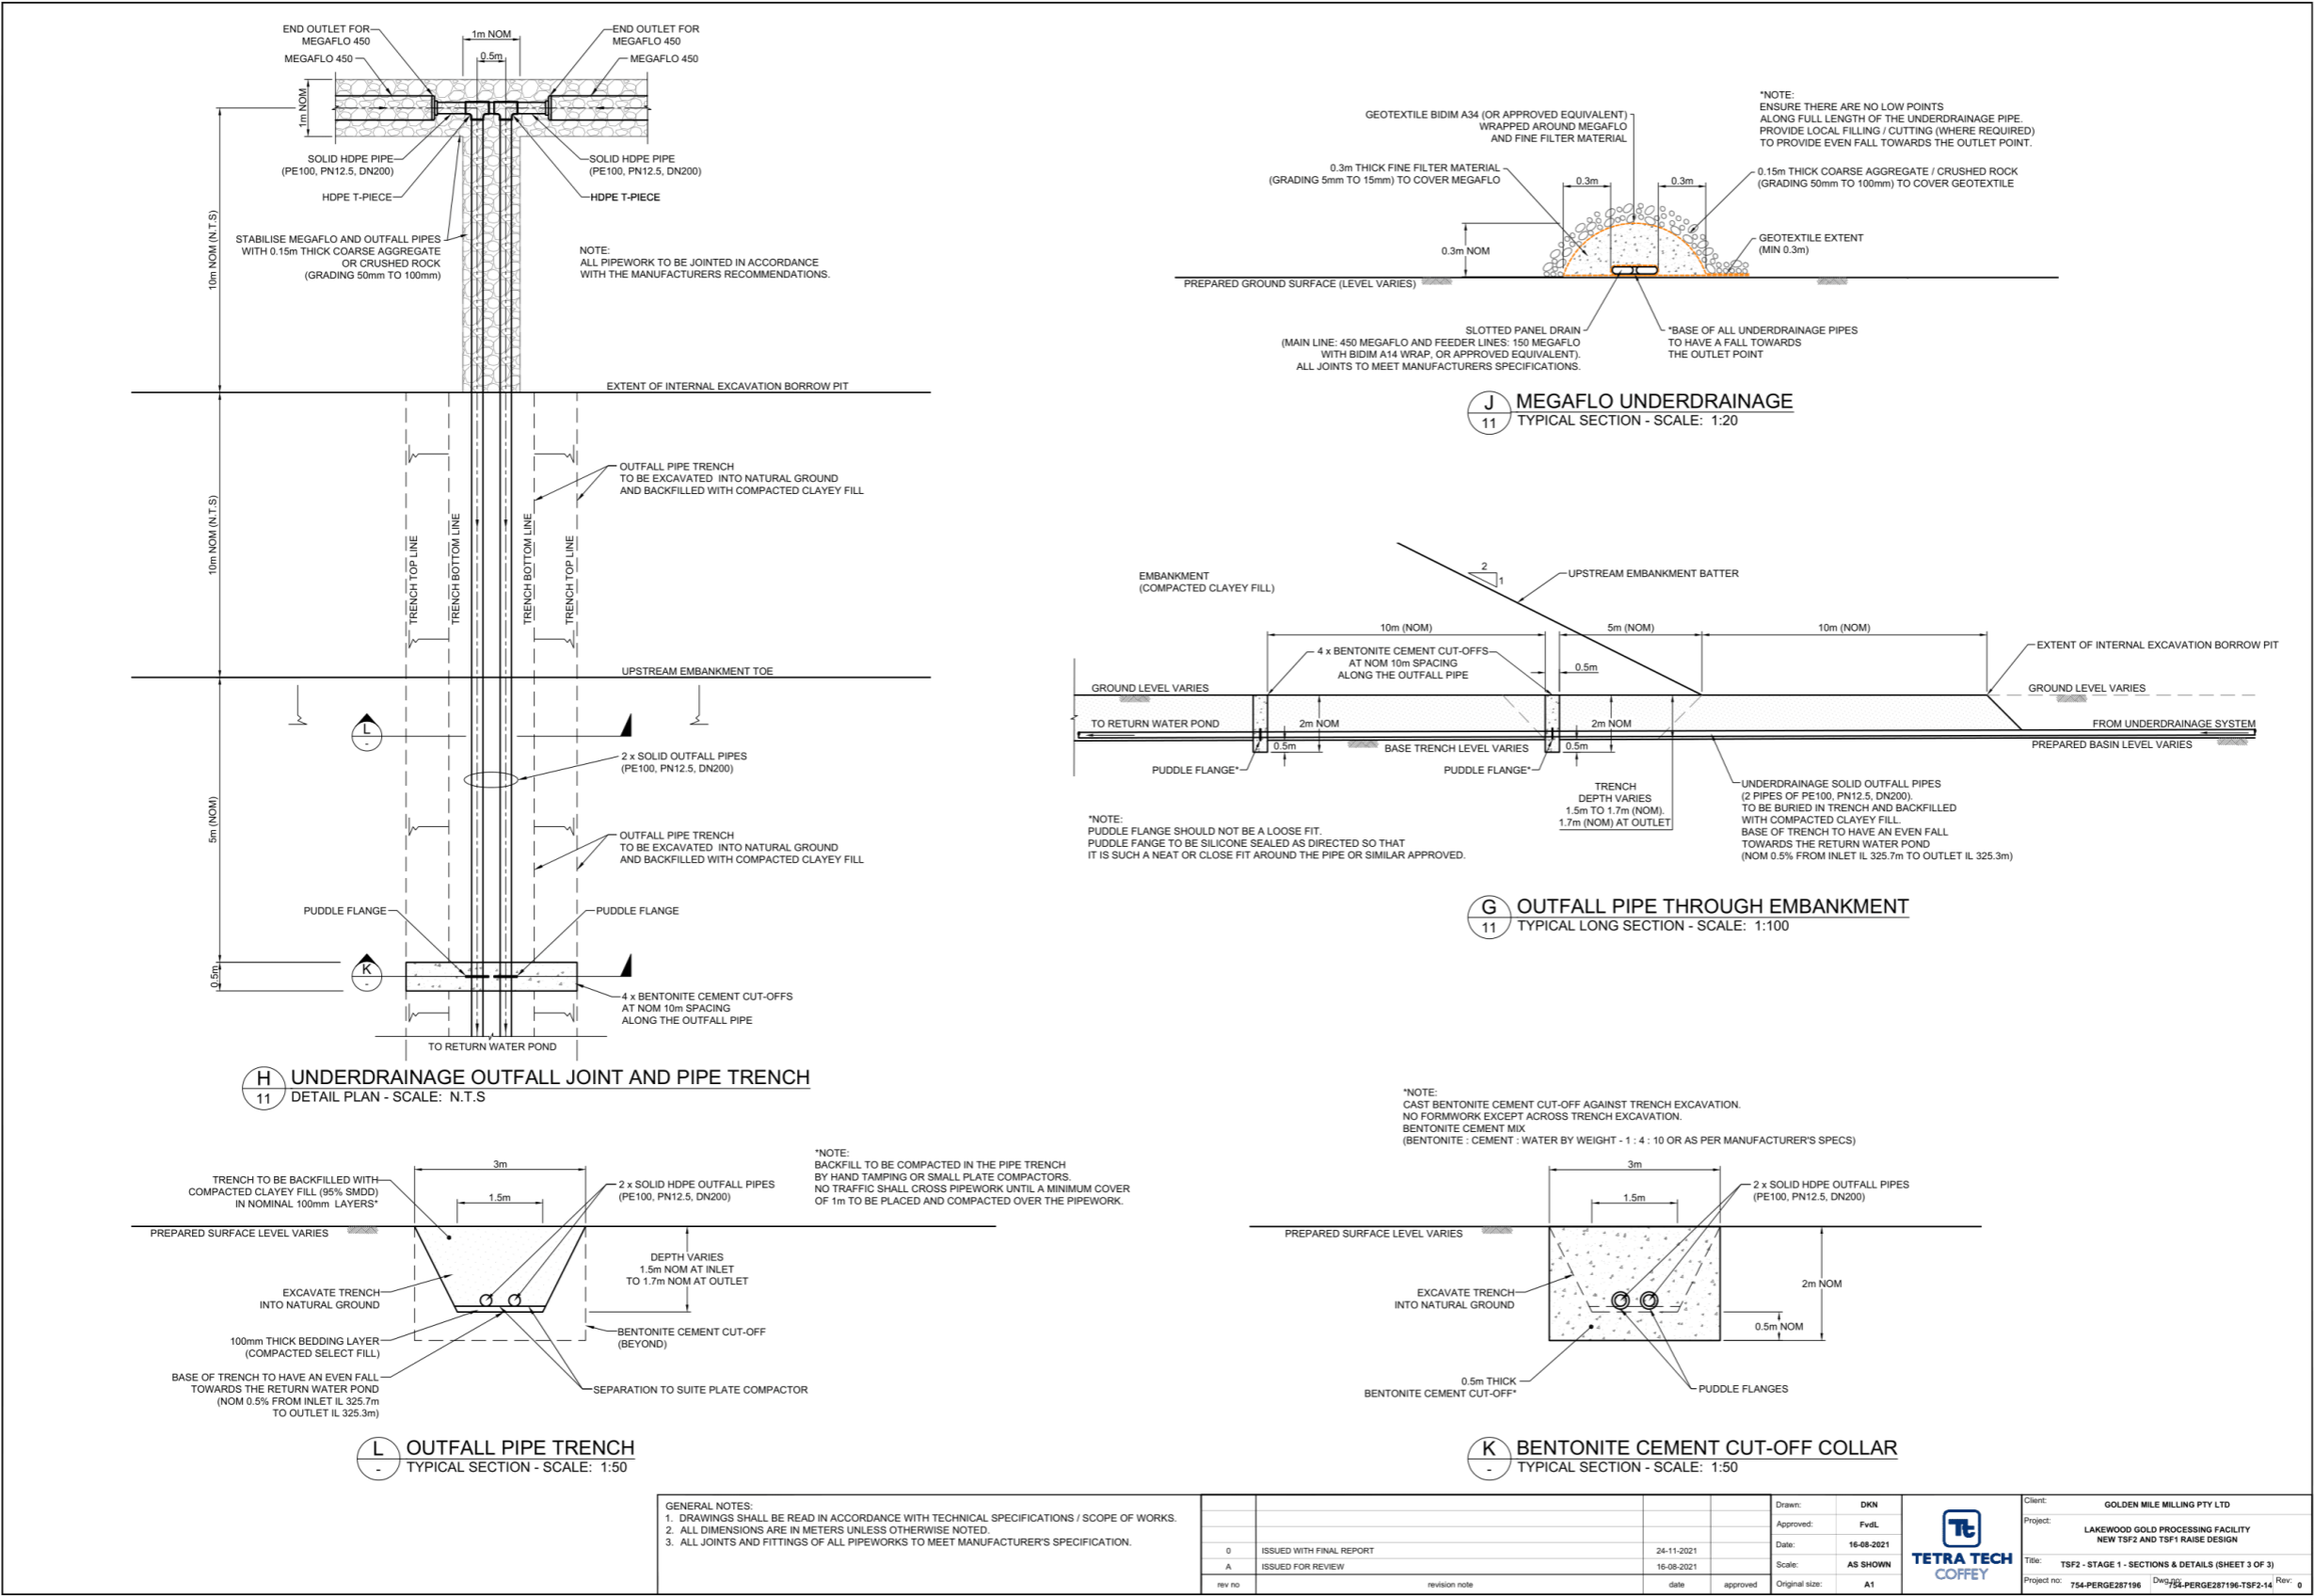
TSF2 – Stage 1 underdrainage and outfall pipe trench construction drawings
